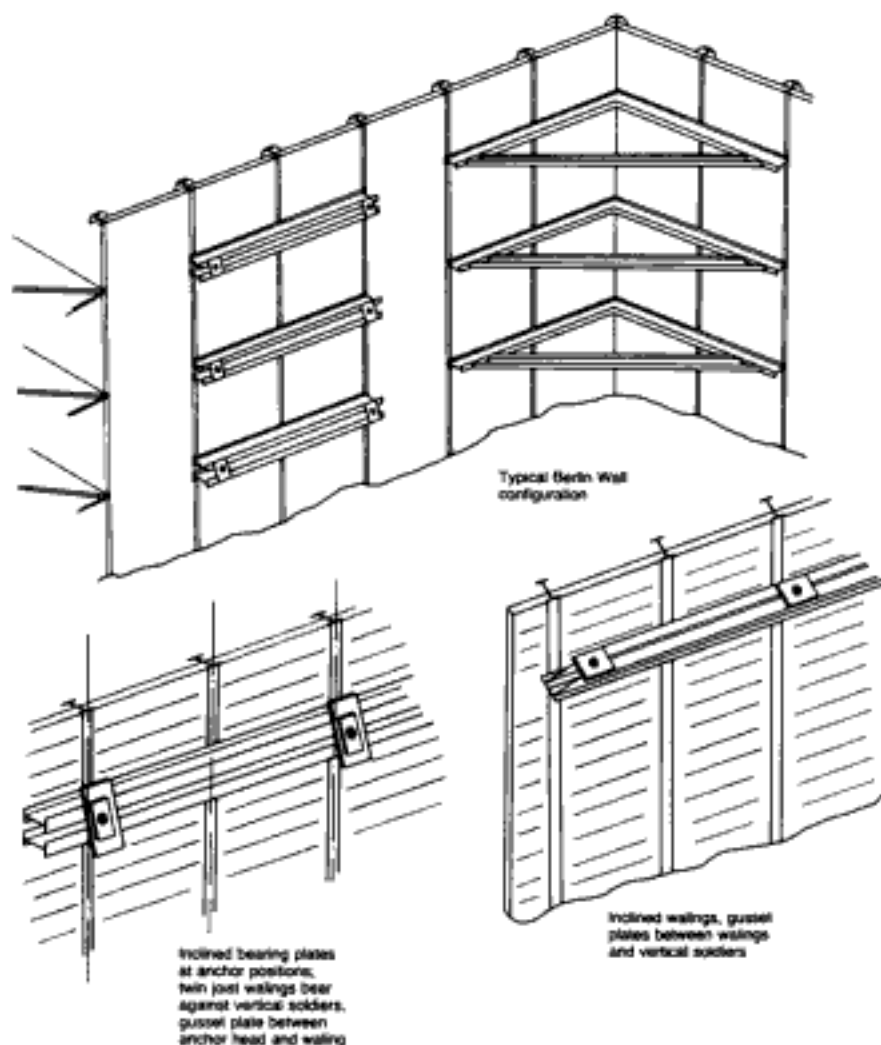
Waling details with inclined anchors, shown with typical Berlin wall
